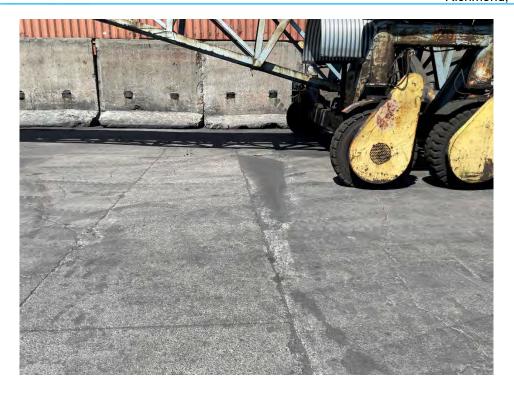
Looking west at seam in the concrete within the secondary bulk product storage area (SW-4). Over laying concrete appears to be slightly deteriorated.
